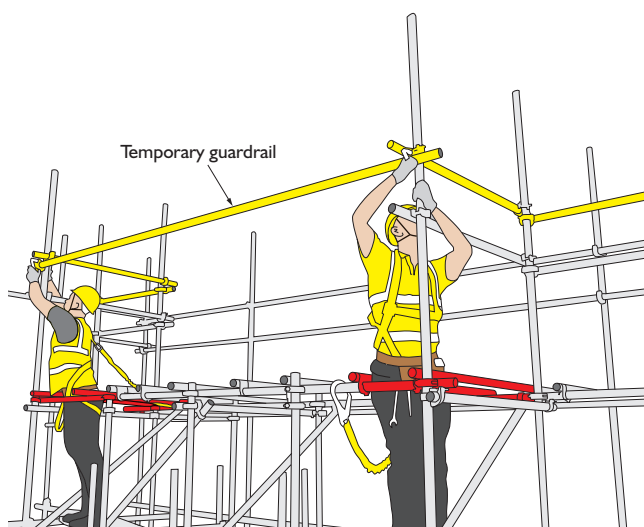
Temporary guardrail to maintain a scaffolders' safe zone for loading bay gate installation and removal. The temporary guardrail is removed once the gate is installed.
